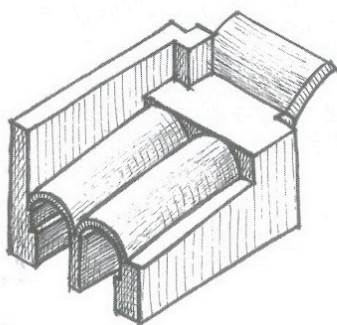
Typical configuration of pier; taken from [Torre, 2003].
